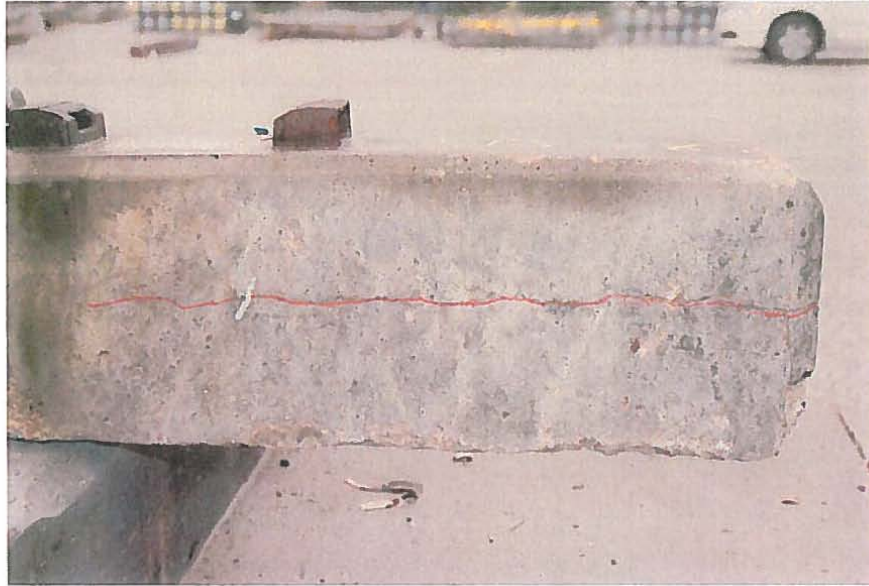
Cross-section at saw cut 28 ½ inches from north end of tie NDT #2, inboard of rail pad towers. L3672 102312 60
